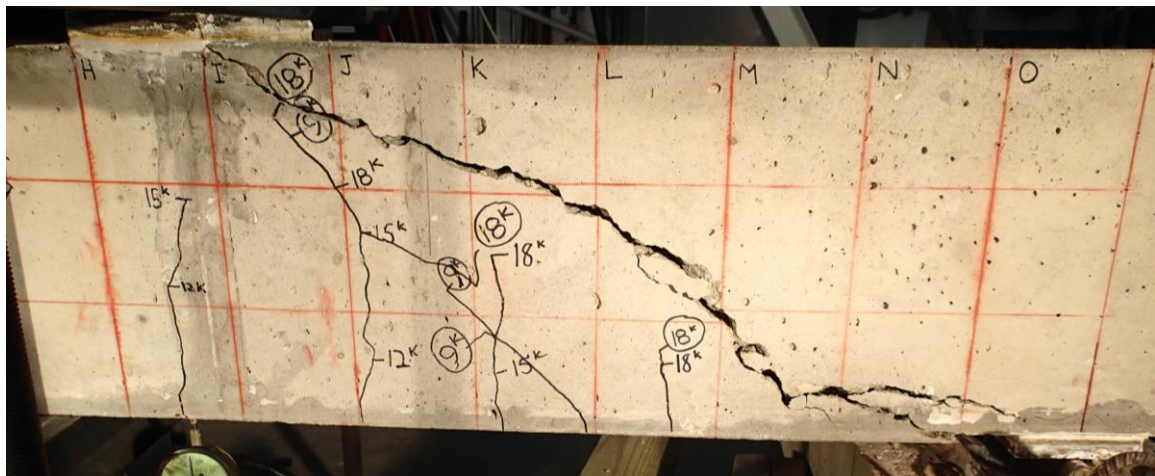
Specimen K-1: South Side Failure Inclined Crack
